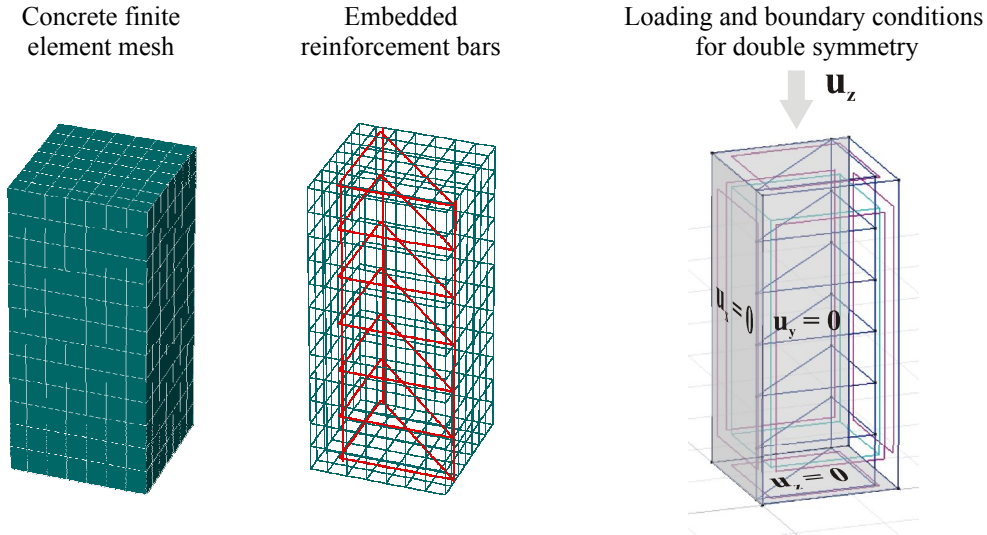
Concrete and reinforcement modelling, boundary conditions and loading.
